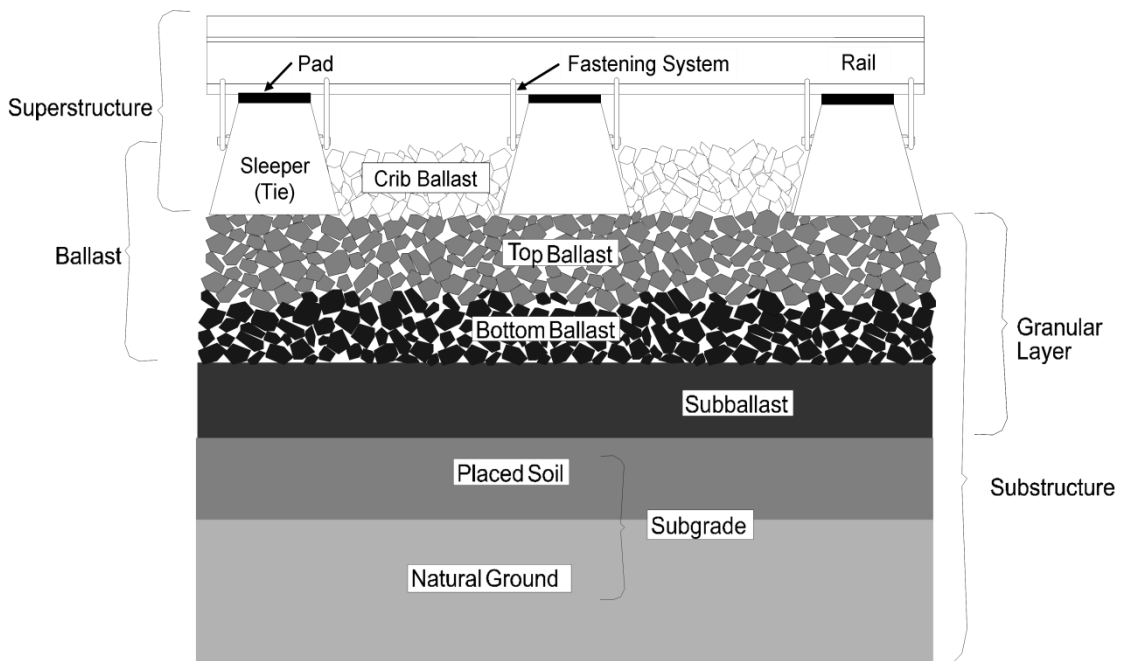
Typical ballasted track structure (adapted from Selig & Waters, 1994)
